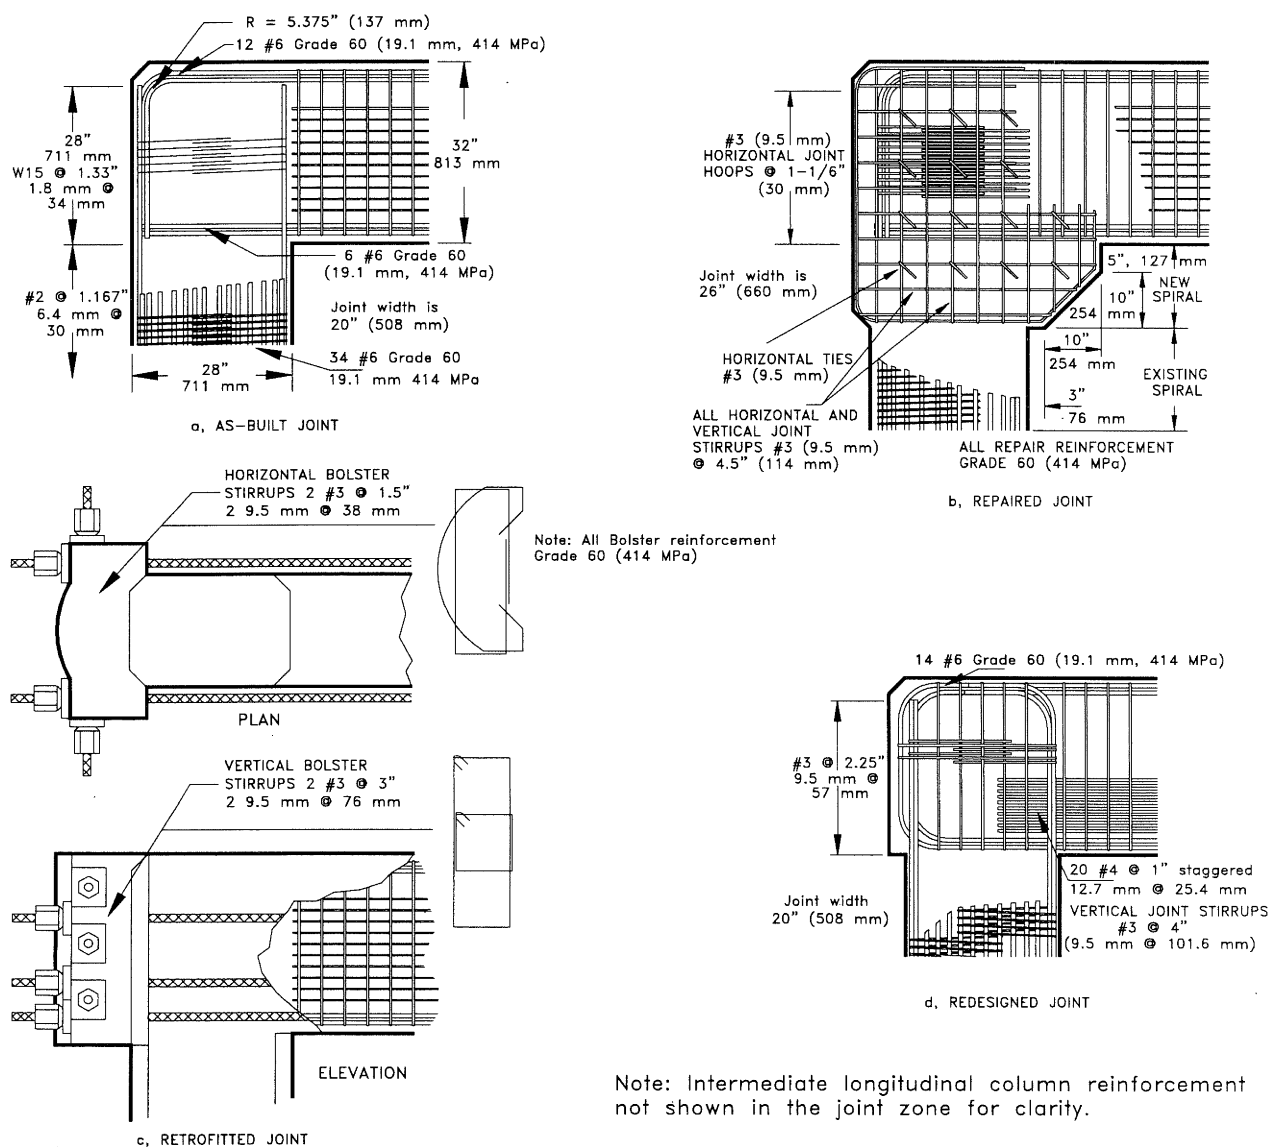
Details of four bridge knee joint units having columns with interlocking spirals.
